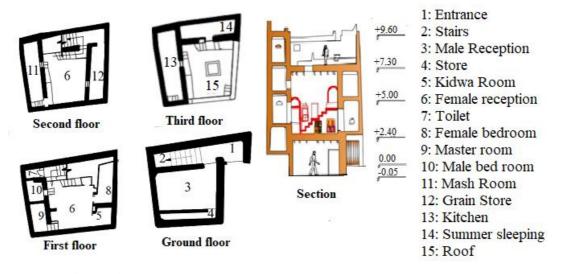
Example 1 showing the layout of floor plans and section (Shawesh, 1996)
